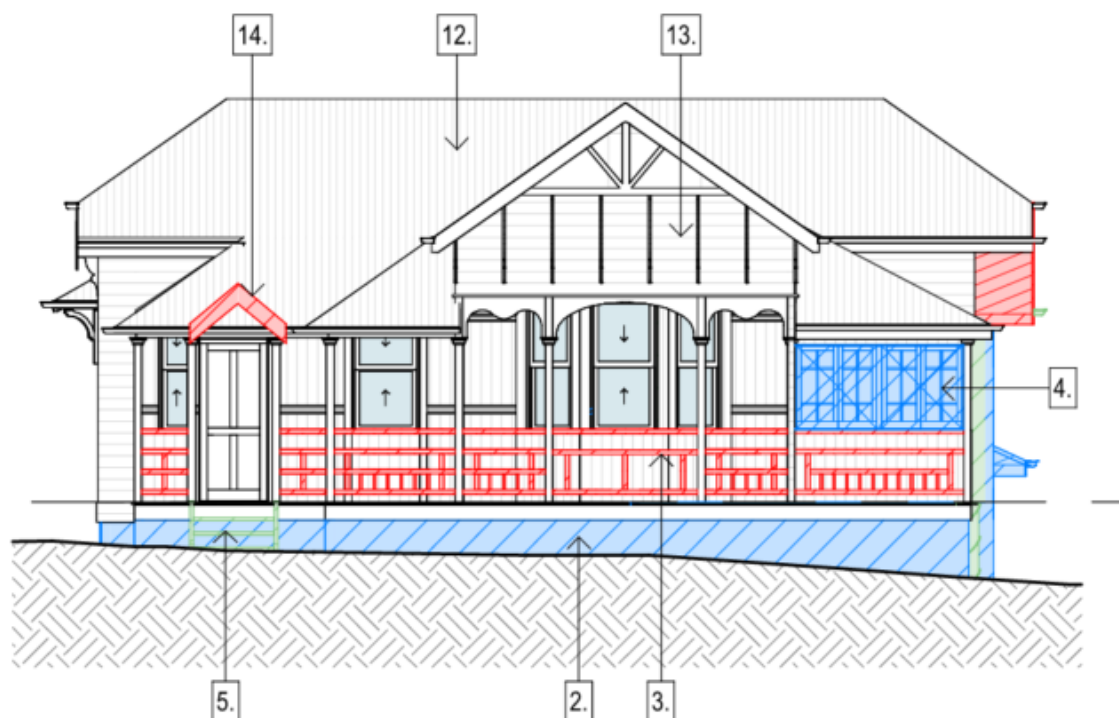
Proposed Demolition - Western Elevation (Perrott Street)
